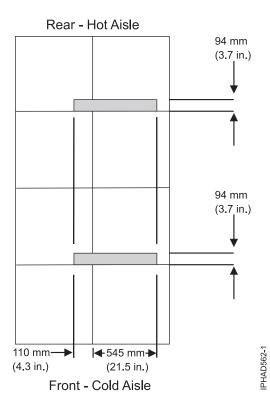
Cable cutout placement 600 mm (23.6 in.) tiles
